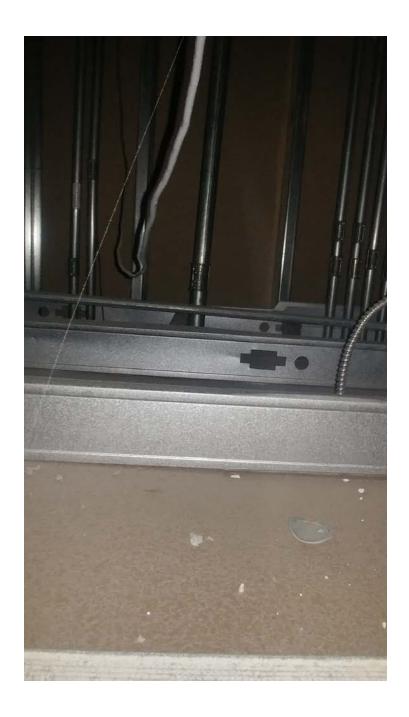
Box Office Washroom- Wall Access Showing Fiberglass Insulation
